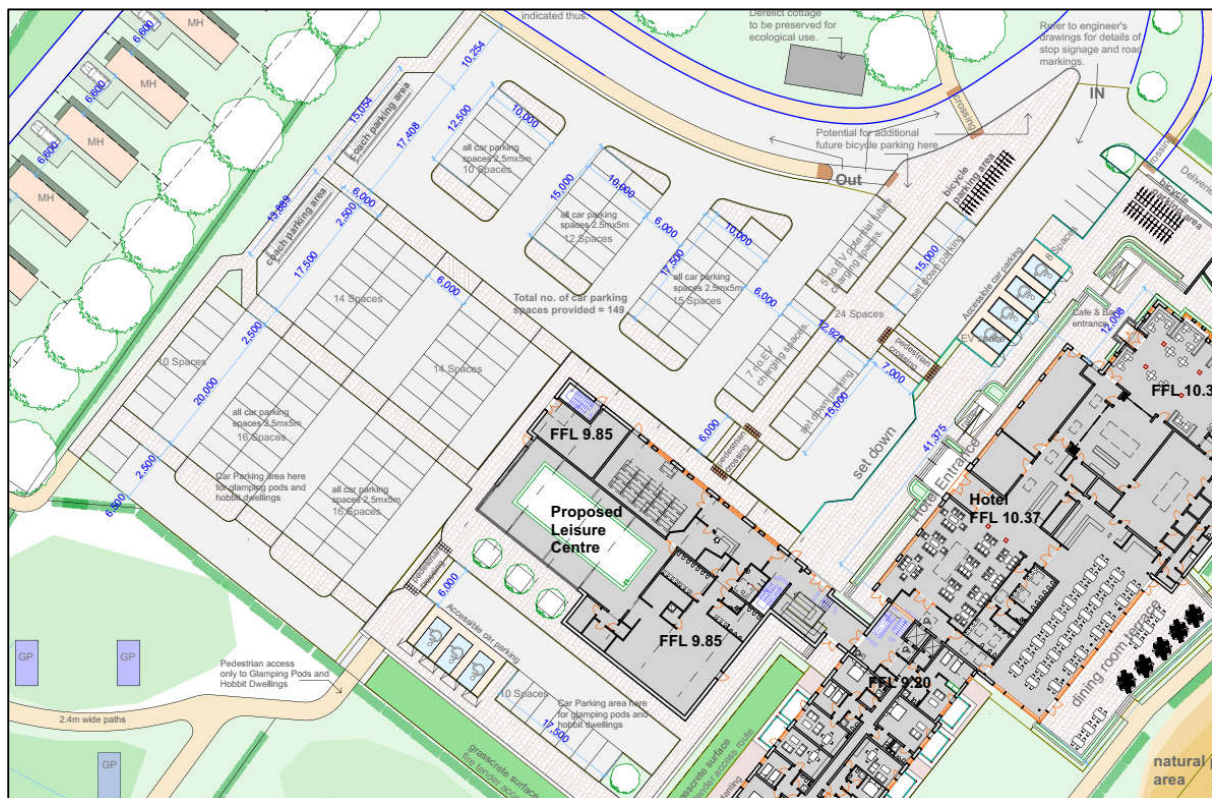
Section of site layout indicating central parking facilities adjacent to the Hotel and Leisure Centre.
